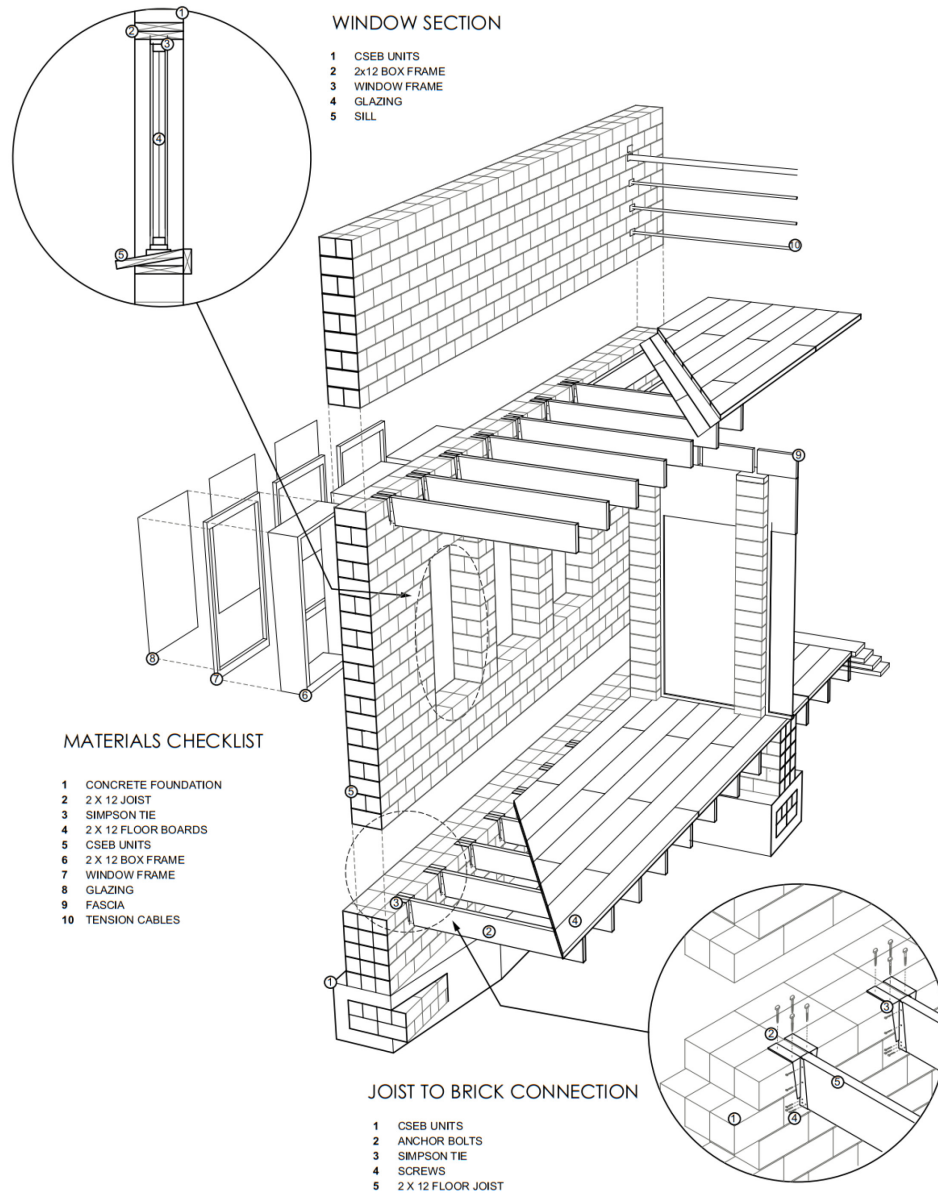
Exploded axonometric illustrations of the different assemblies in the shotgun prototype house.
